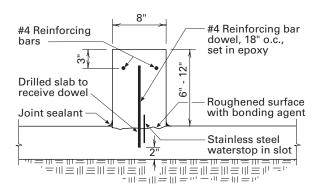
Retrofit curb-to-floor joint (dry or wet joint).
